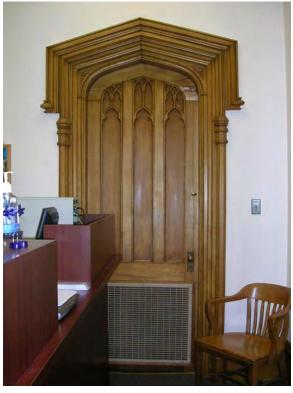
White maple door and trim on east wall connecting to stair tower in Room 103.
